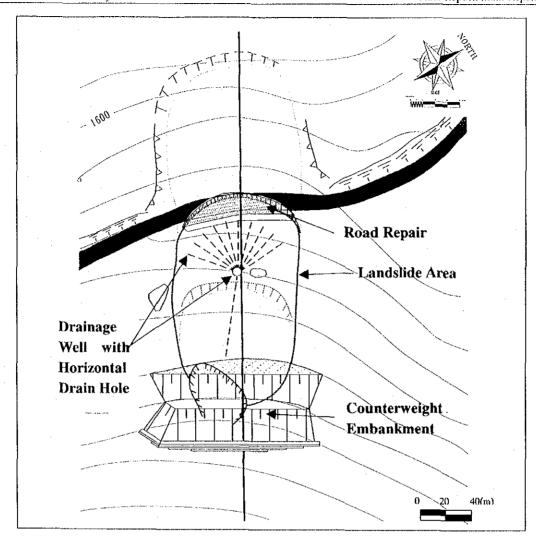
Plan (Horizontal Drainage and Counterweight Embankment)
